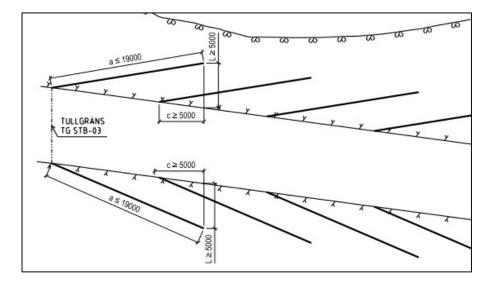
Borehole's length, overlap, and stick in specific grouting fan in passage near existing structure zone.
